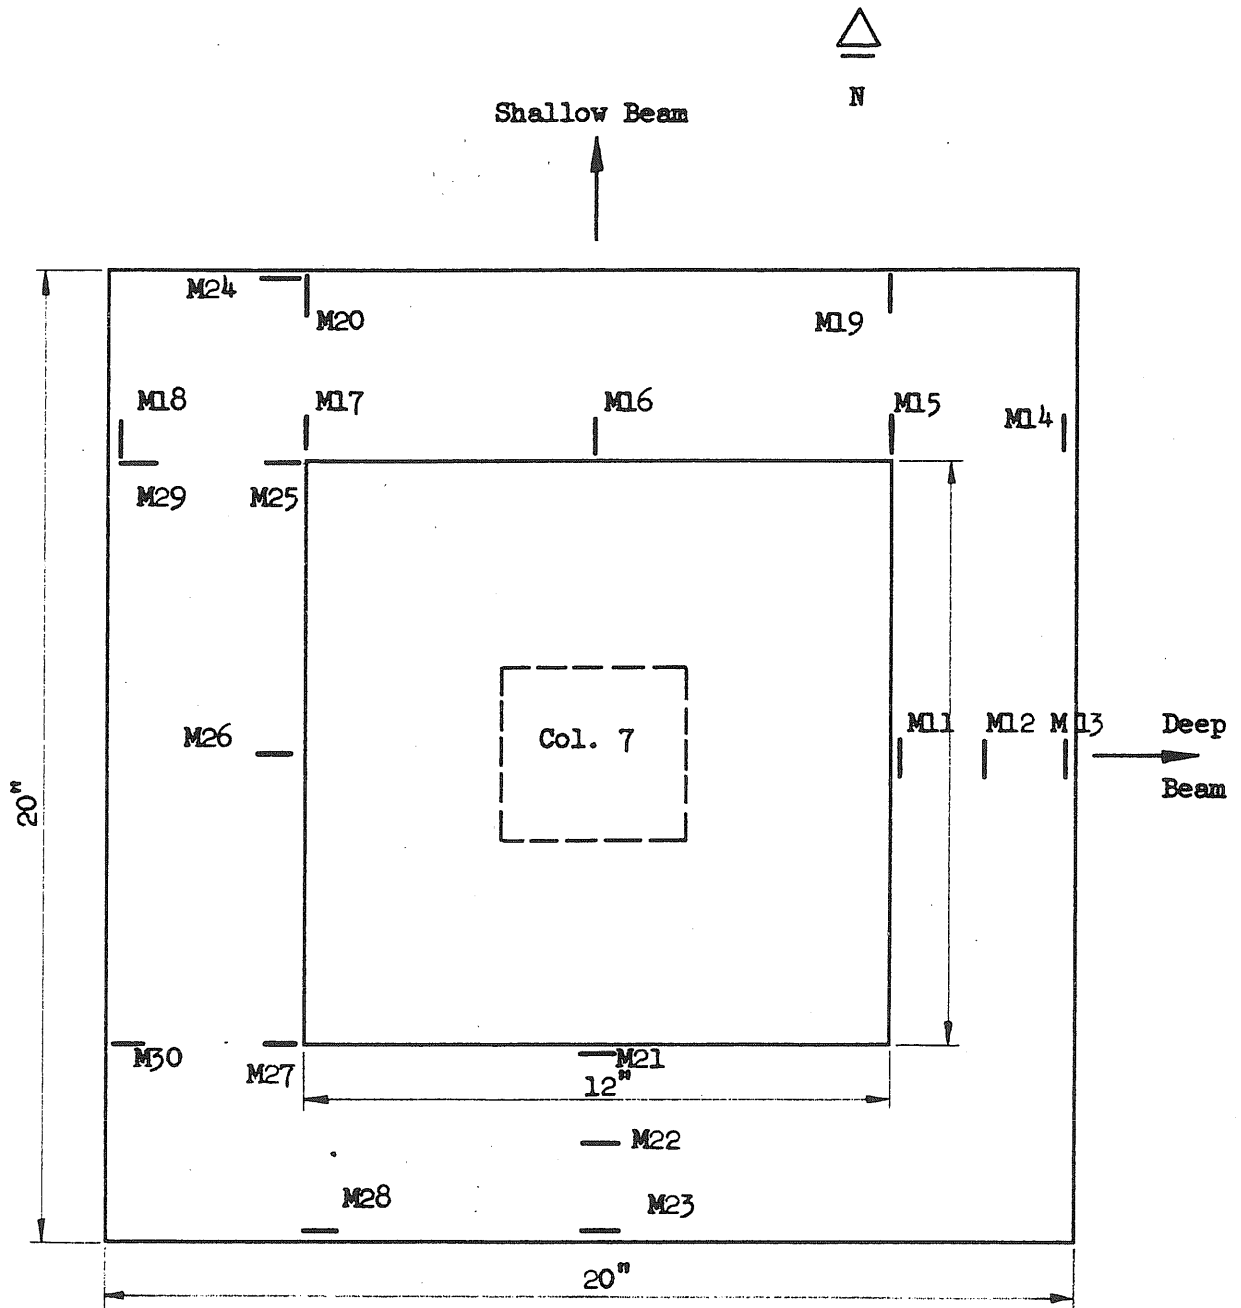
LOCATION AND DESIGNATION OF CONCRETE STRAIN GAGES ON DROP PANEL AT COLUMN 7
